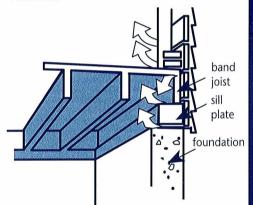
Get rid of drafts along the floor by caulking along the sill plate and band joist in the basement.
